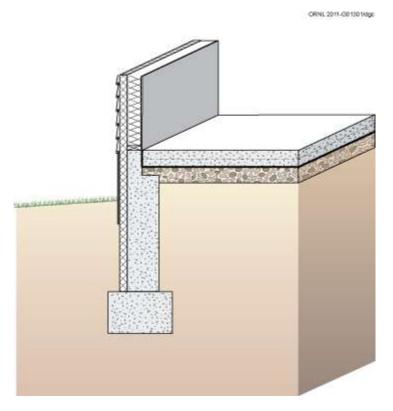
Slab-on-Grade Foundation with Exterior Insulation
